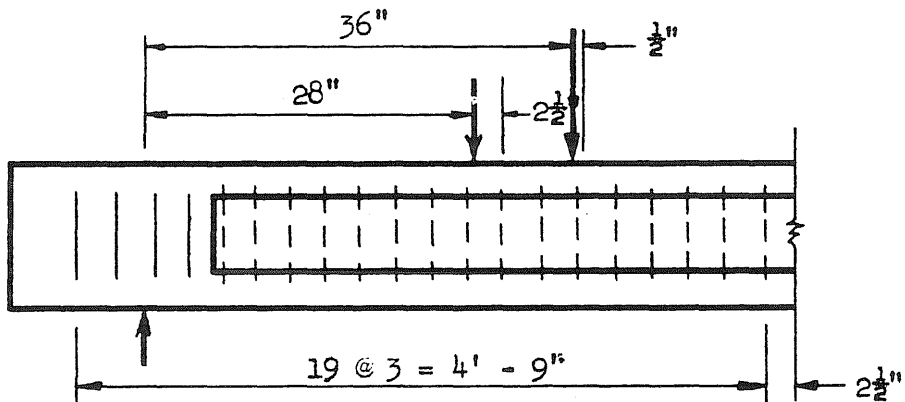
TYPICAL STIRRUP ARRANGEMENTS: TWO-POINT LOADS
